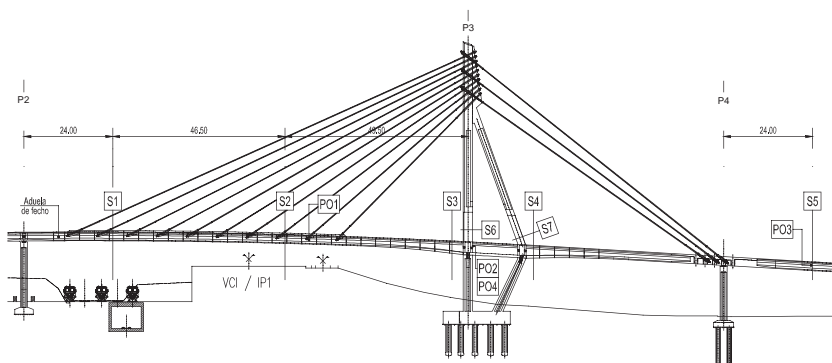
Location of the instrumented sections (S1 to S7) and observation stations (P01 to P04).
